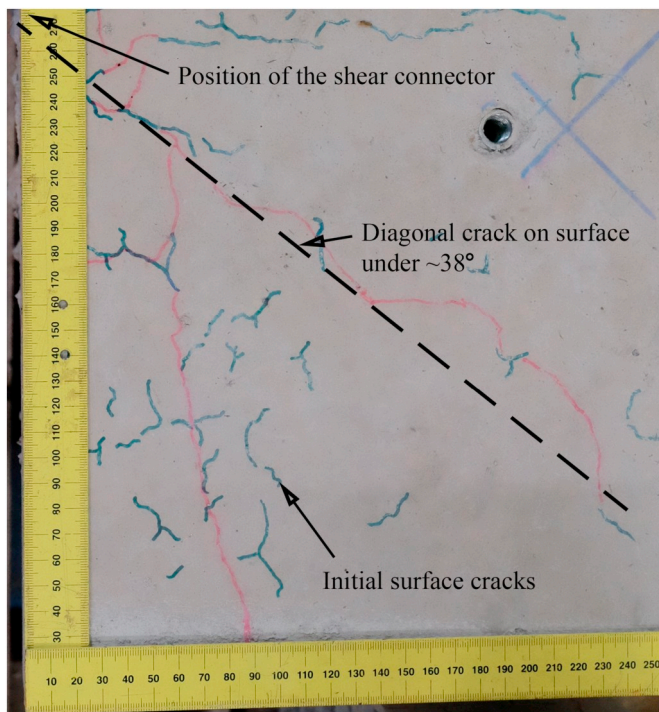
Cracks at the concrete surface in the specimen Av2 (For the view reference see Fig. 10).
